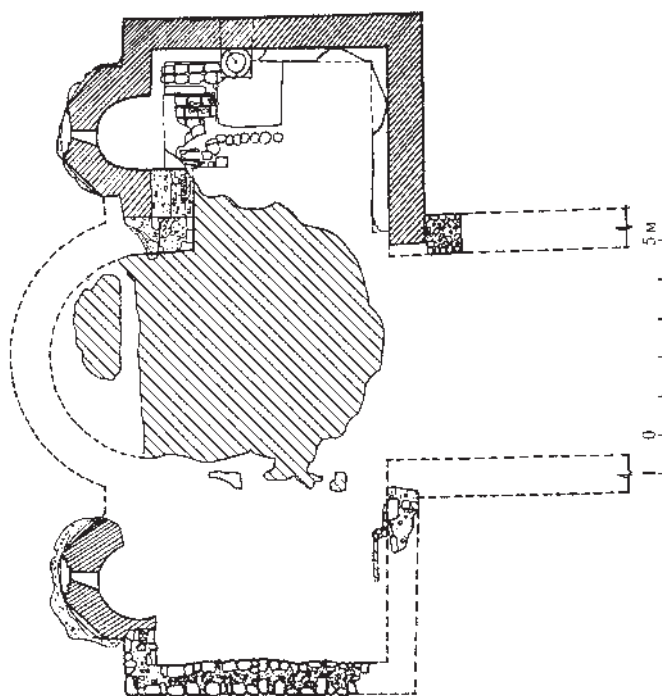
Pityus: plan of church no. 7 outside the city walls.
